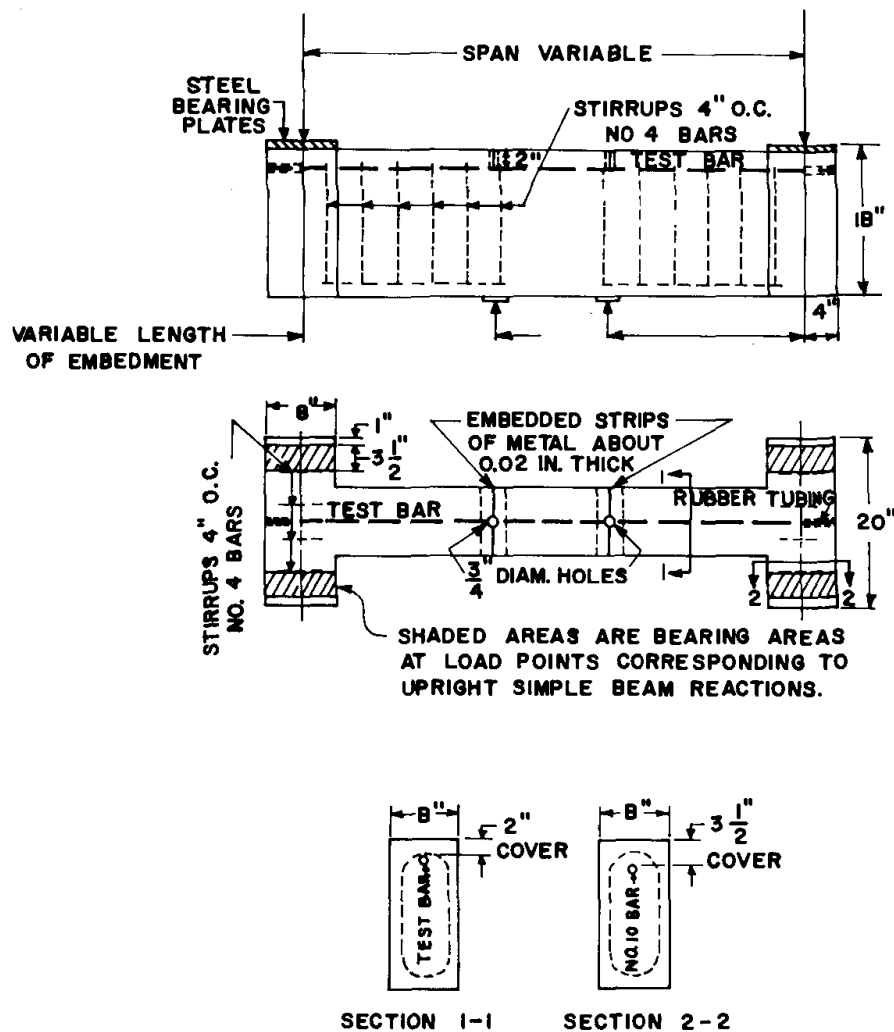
Elevation, plan, and cross section of beam specimen, Ref. 8.
